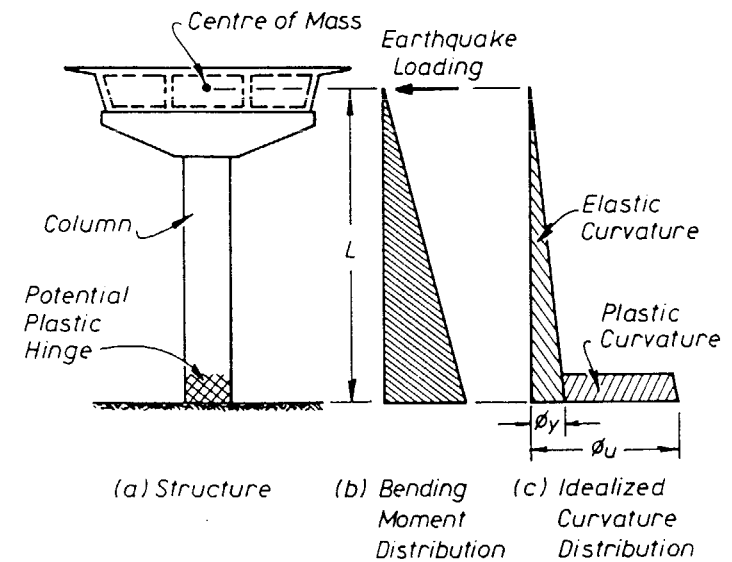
Cantilever-Bridge Column with Lateral Earthquake Loading at Ultimate Lateral Displacement
